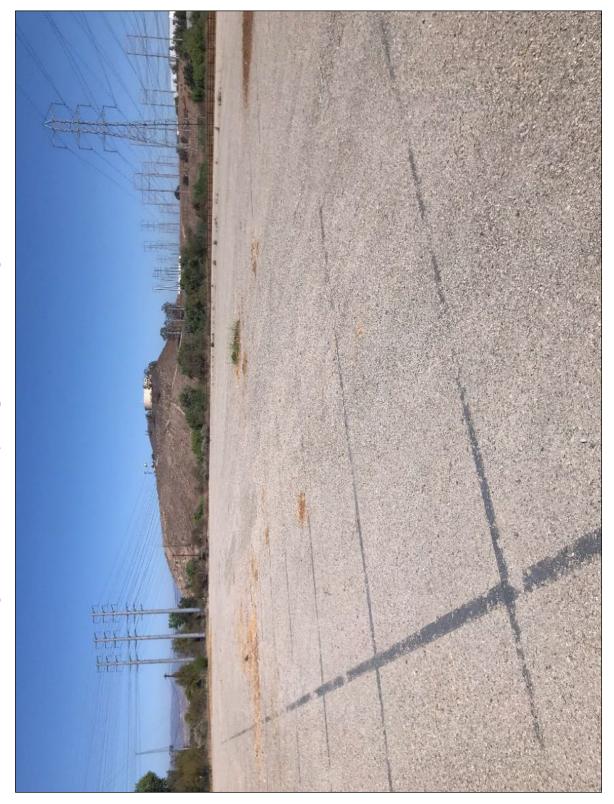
Backcountry Pump Station Site, Facing Northwest
